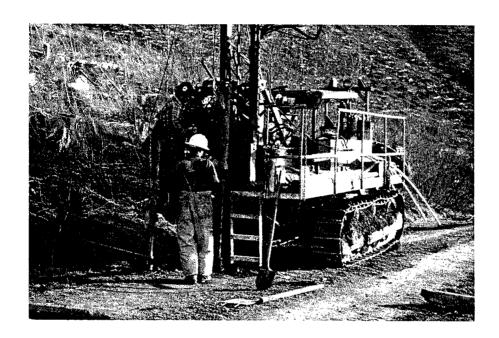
Steel Tracked Caterpillar Type Mounted Drill
